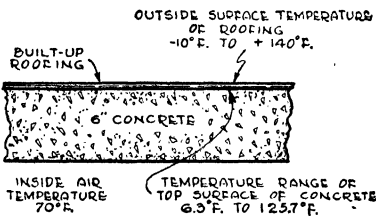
Section through 6-inch Concrete Roof without Insulation
